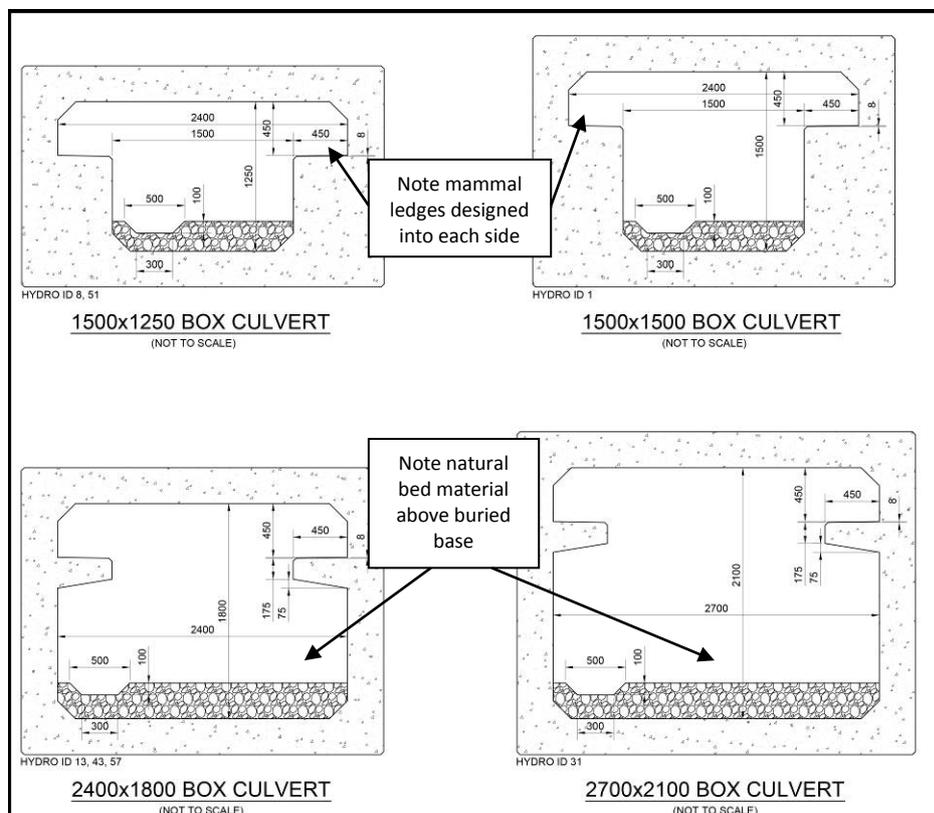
Typical cross-sections of buried box culverts with bed material and mammal ledges
